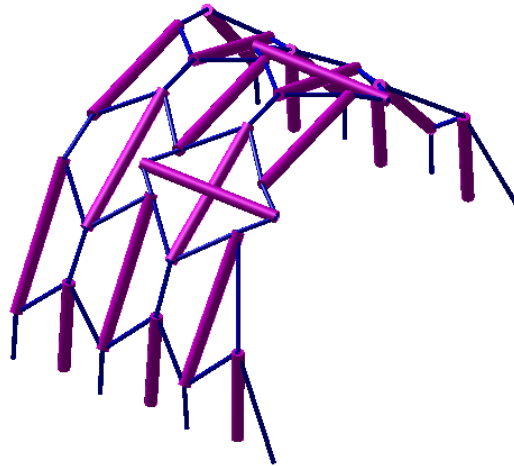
Cylindrical roof structure with 7 elements in the transversal section
